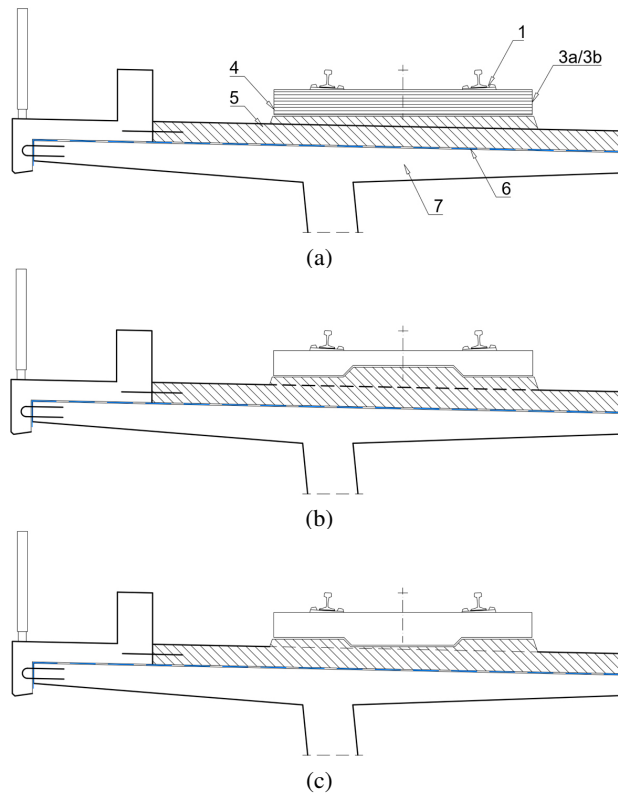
Slab track with in-situ concrete (“monolithic” type) or with precast elements with sealing layer on bridge deck [4]: (a) Protective concrete layer integral with lower slab, (b) protective concrete layer integral with lower slab (using a stopper as restraint), (c) protective concrete layer integral with lower slab (using a recess as restraint); 1 – Rail fastening, 2 – Embedded sleeper, 3 – Slab with embedded sleeper, 3a – Upper slab with in-situ concrete but not embedded sleeper, 3b – Upper slab, constructed with precast elements, 4 – Lower slab, can incorporate restraint detail (not shown) 5 – Protective concrete layer (part of lower slab), 6 – Sealing layer of the bridge deck, 7 – bridge deck
